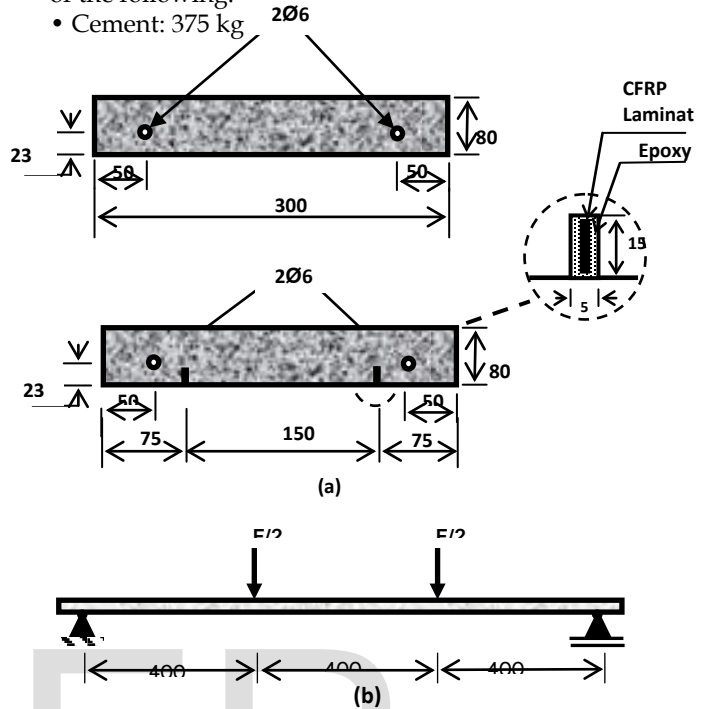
(a) RCS dimension and position of the steel bars and CFRP laminates, (b) load configuration.(all dimensions in mm).
